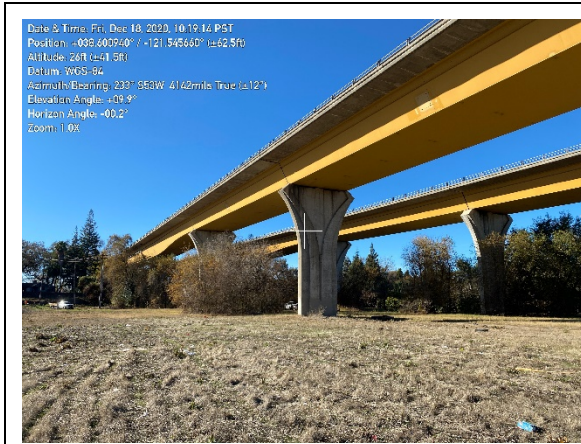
Habitat along steel box bridge with multiple expansion joints and crevices observed along the bridge abutment consists of landscaped lawns, mowed areas below the bridge, residential and industrial buildings, homeless encampments, and potential tree roost habitat along the Sacramento River and urban street trees with dense clusters of leaves and crevice (Location #46). Taken facing southwest.
